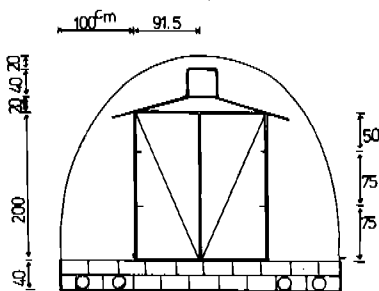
Rear elevational view of greenhouse bulk curing and drying system.
